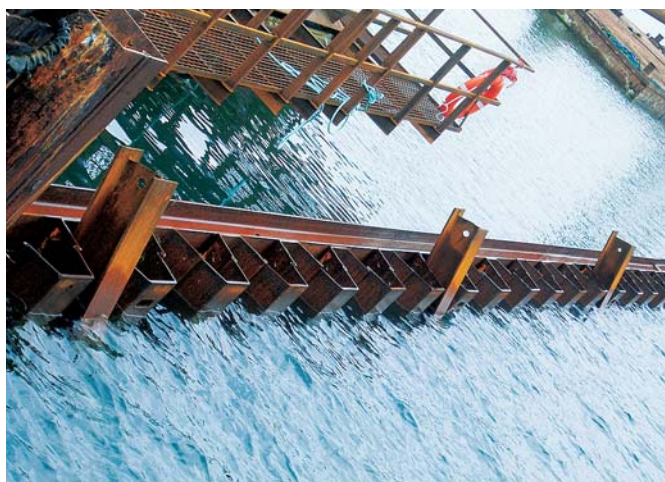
Detail A: End of capping beam of the old CT East. The existing sheet piles of CT East continued a few metres beyond the capping beam.
